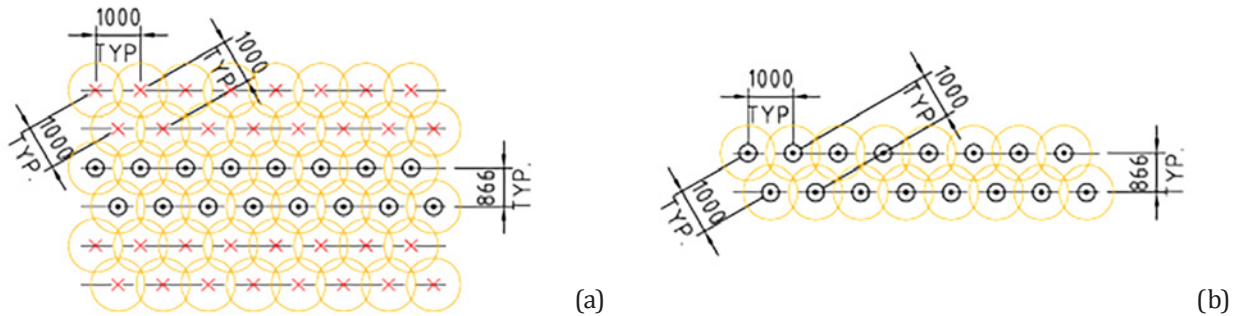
Grout Holes pattern used for (a) Grout walls and (b) Grout block (with secondary holes where required)
